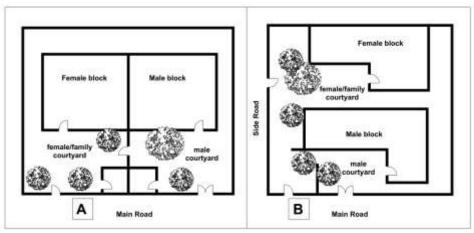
Traditional Courtyard house, layout (A) and layout (B) Source: Author
